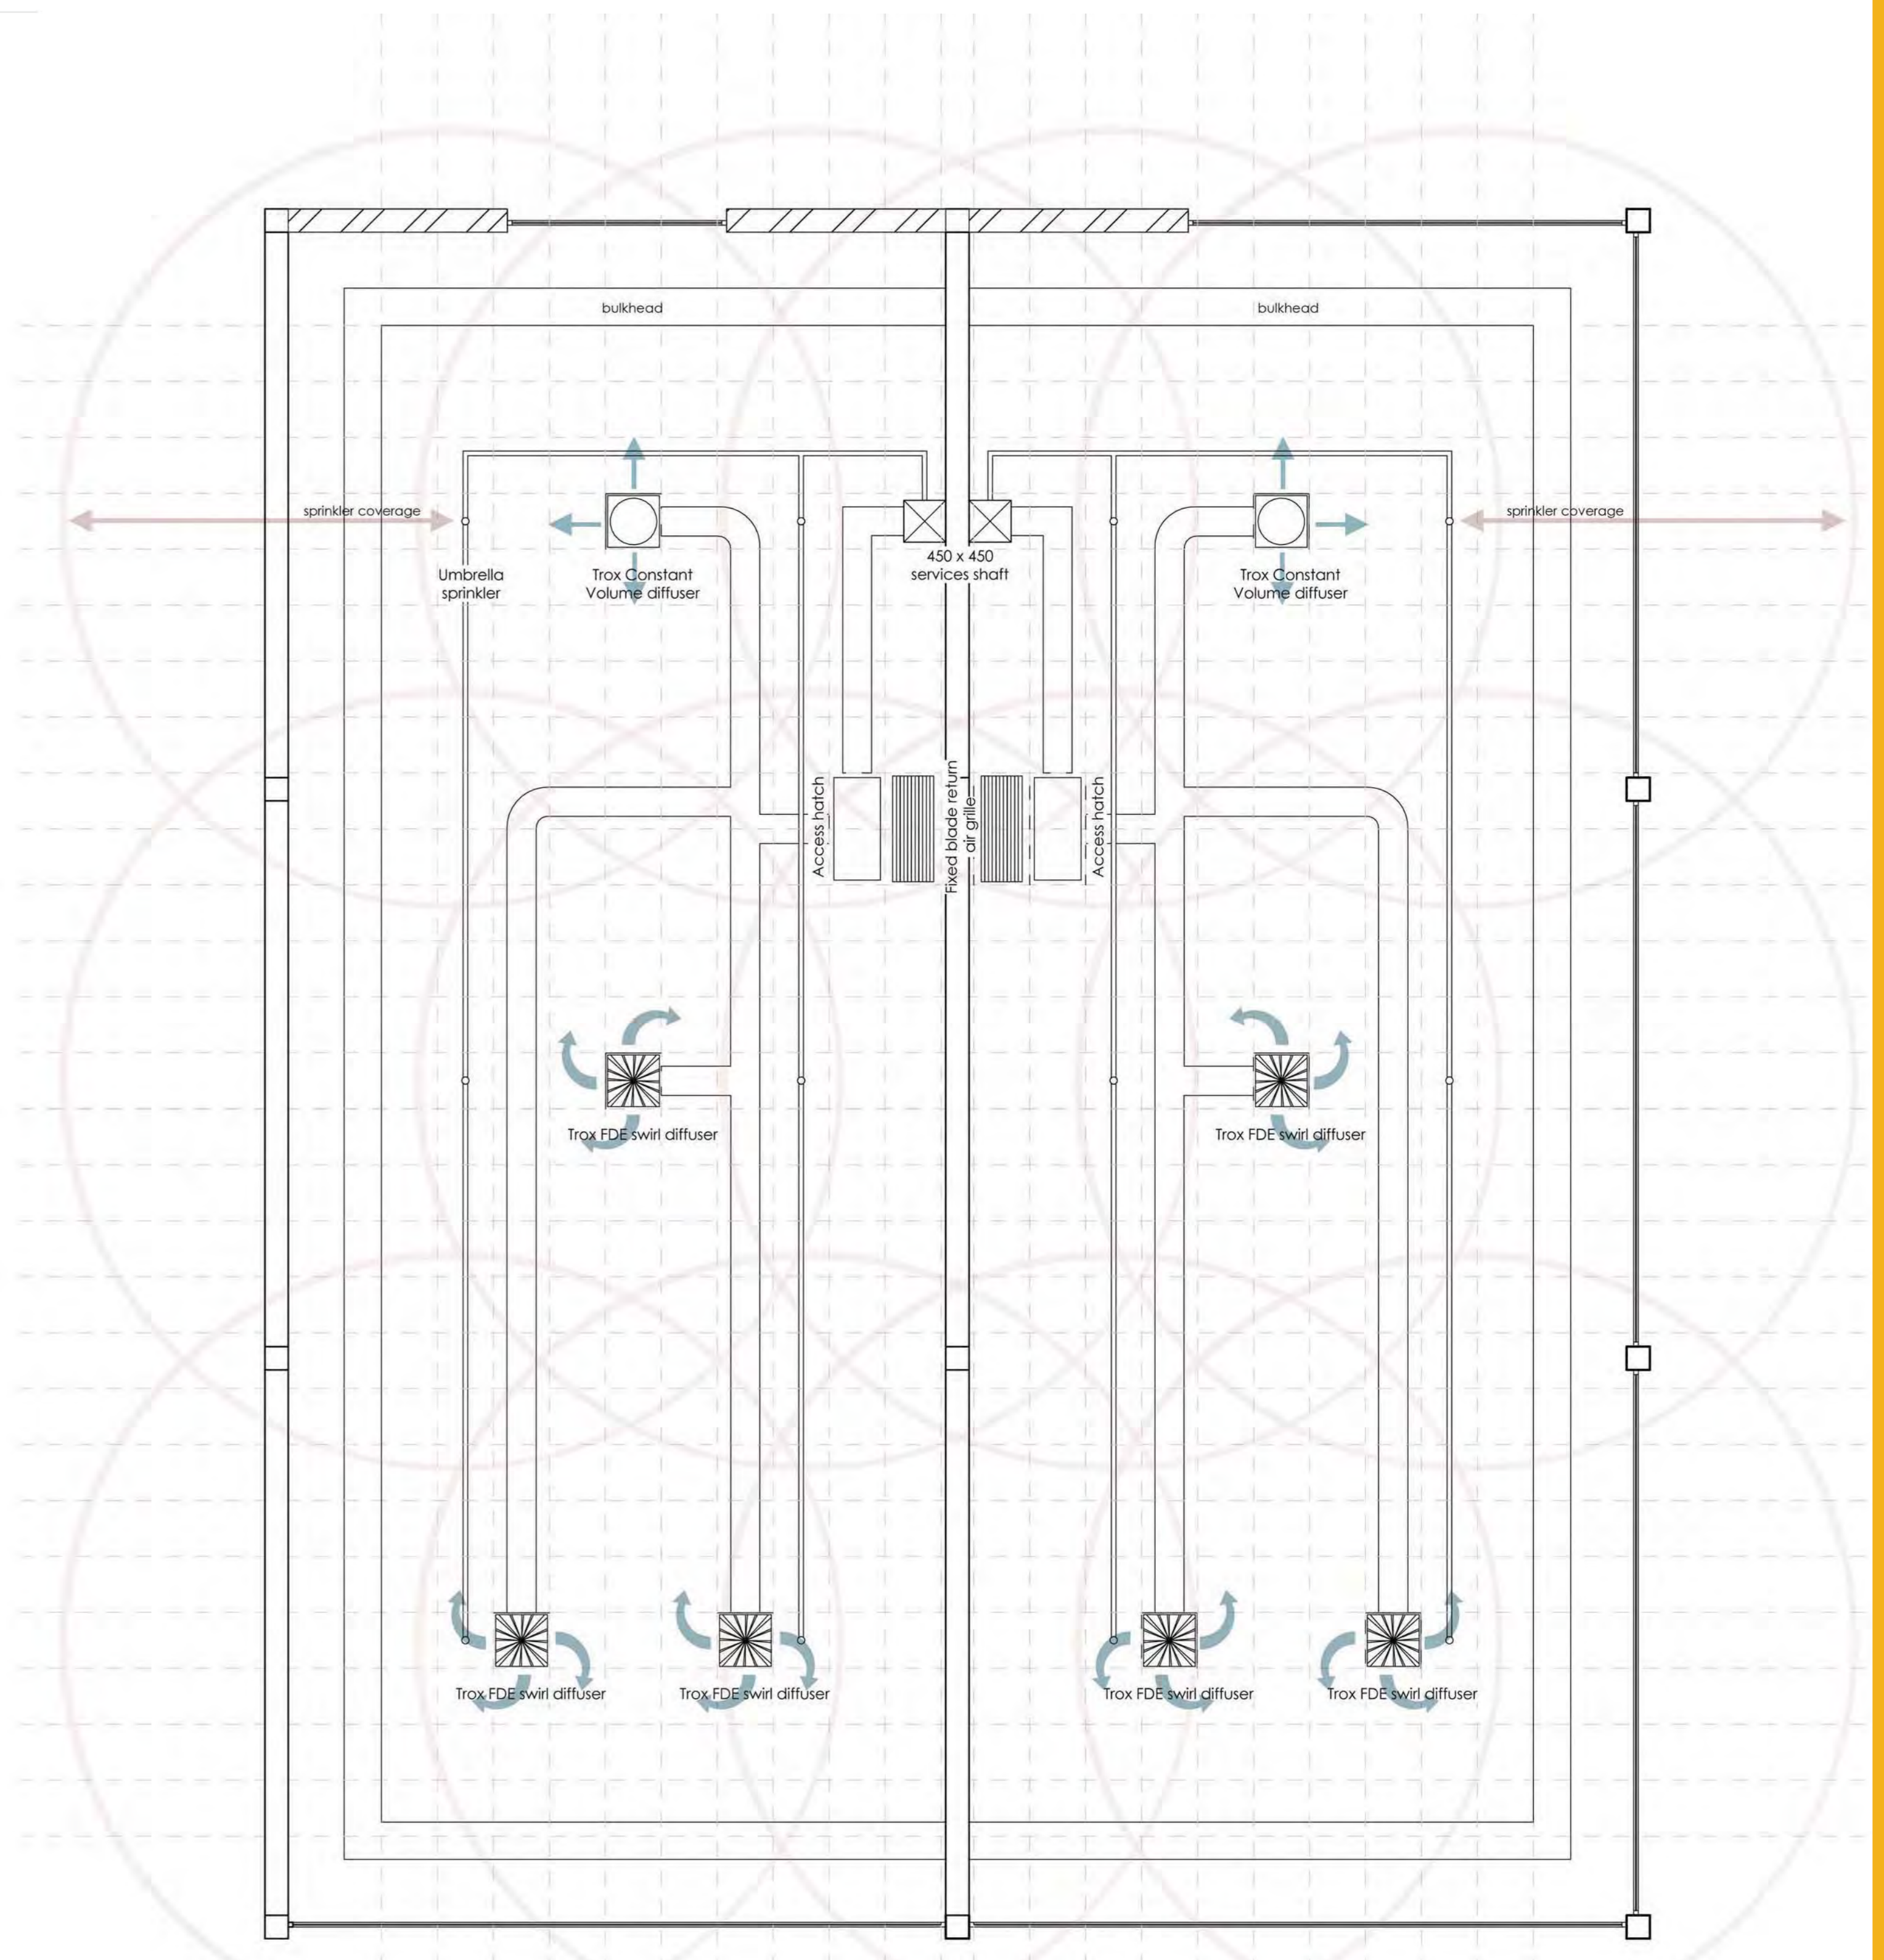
Tenant Space Ceiling Plan with Ventilation and Fire Protection Scale 1:50
